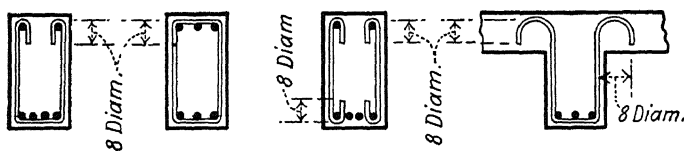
Typical Methods of Anchoring Vertical Stirrups.
